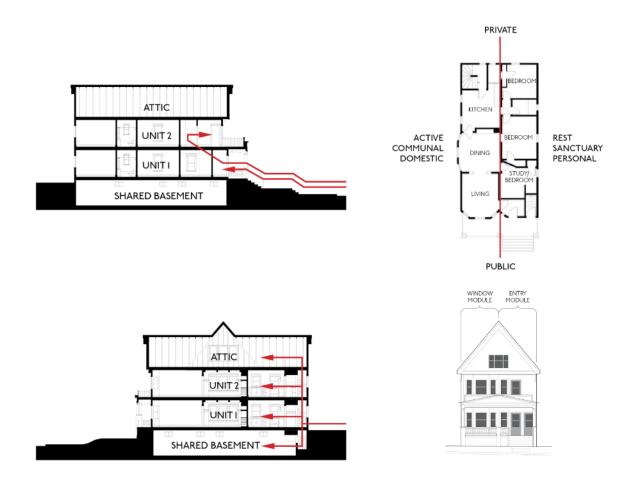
, Sections showing separate front and shared rear entries. Plan and elevation indicate primary zones of the home. (Source: Drawn by Author with measurements from BLC Field School)
